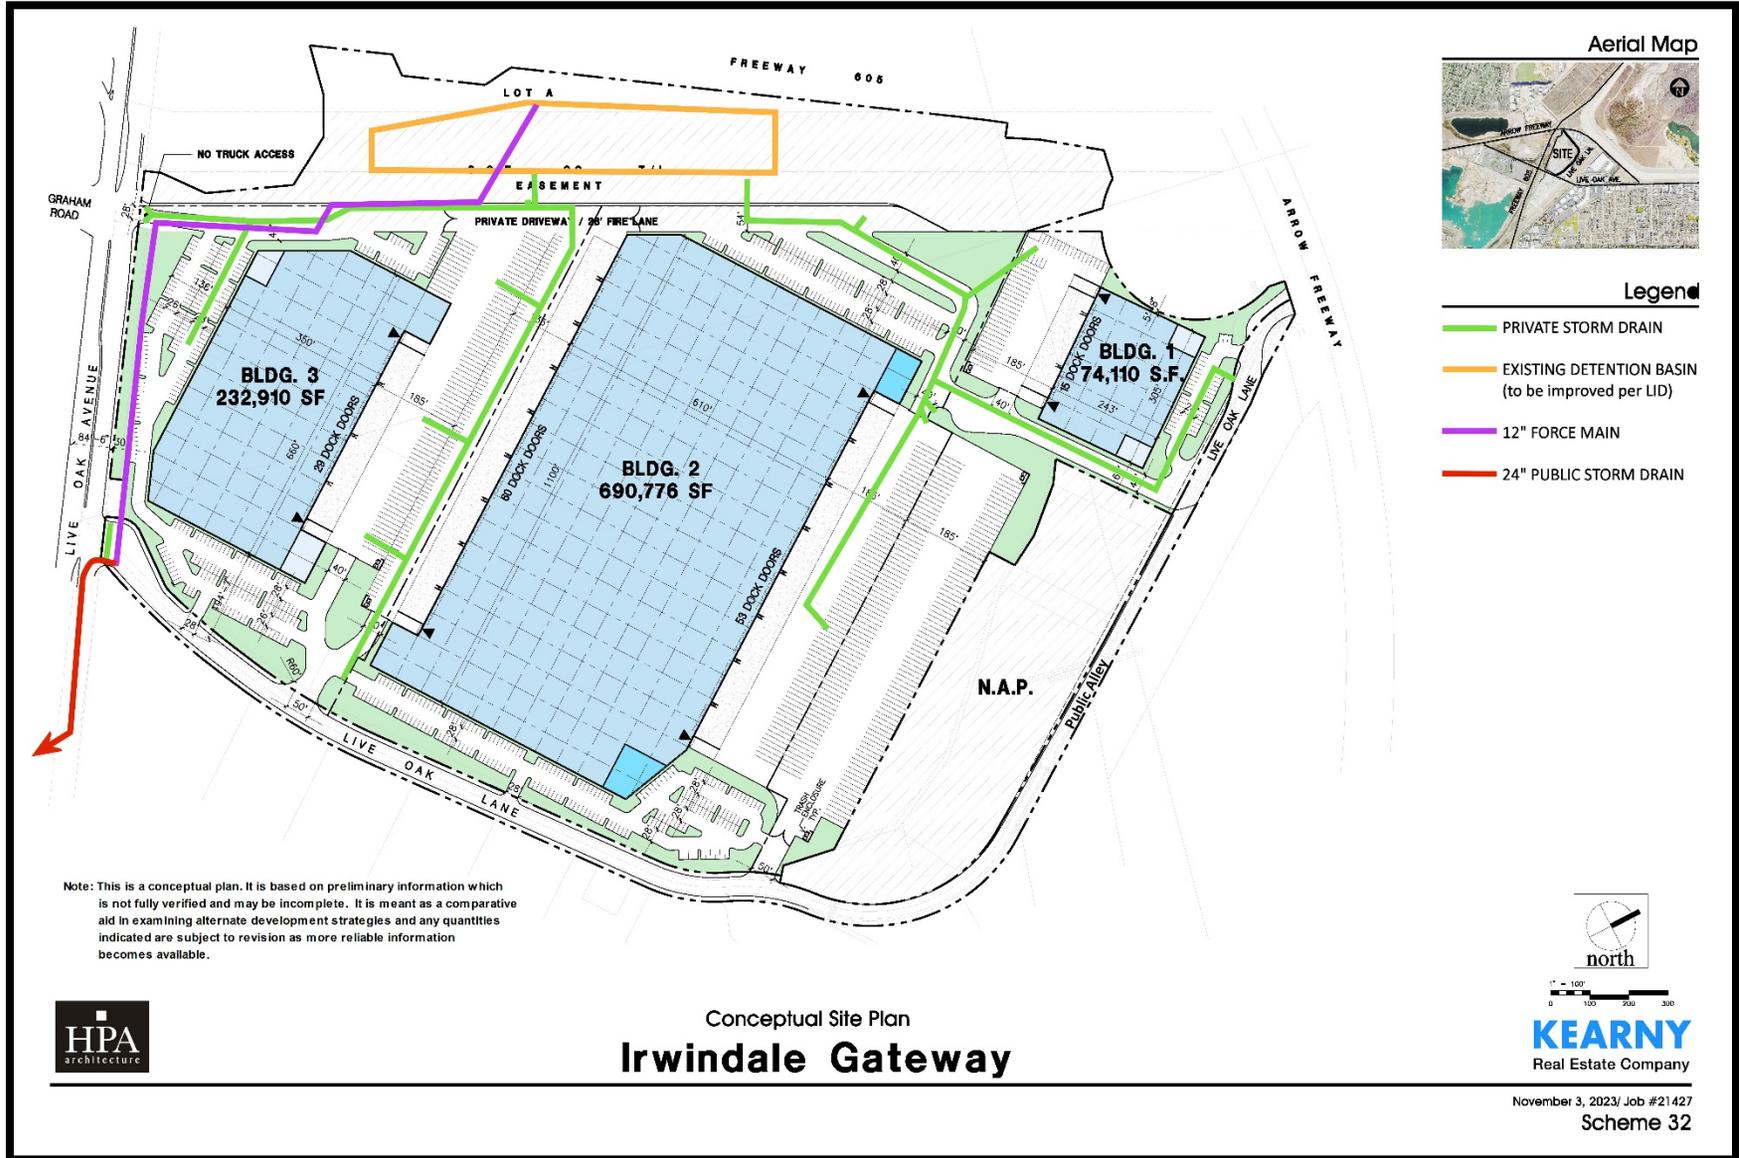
CONCEPTUAL STORM WATER MANGEMENT PLAN WITHOUT BESS
